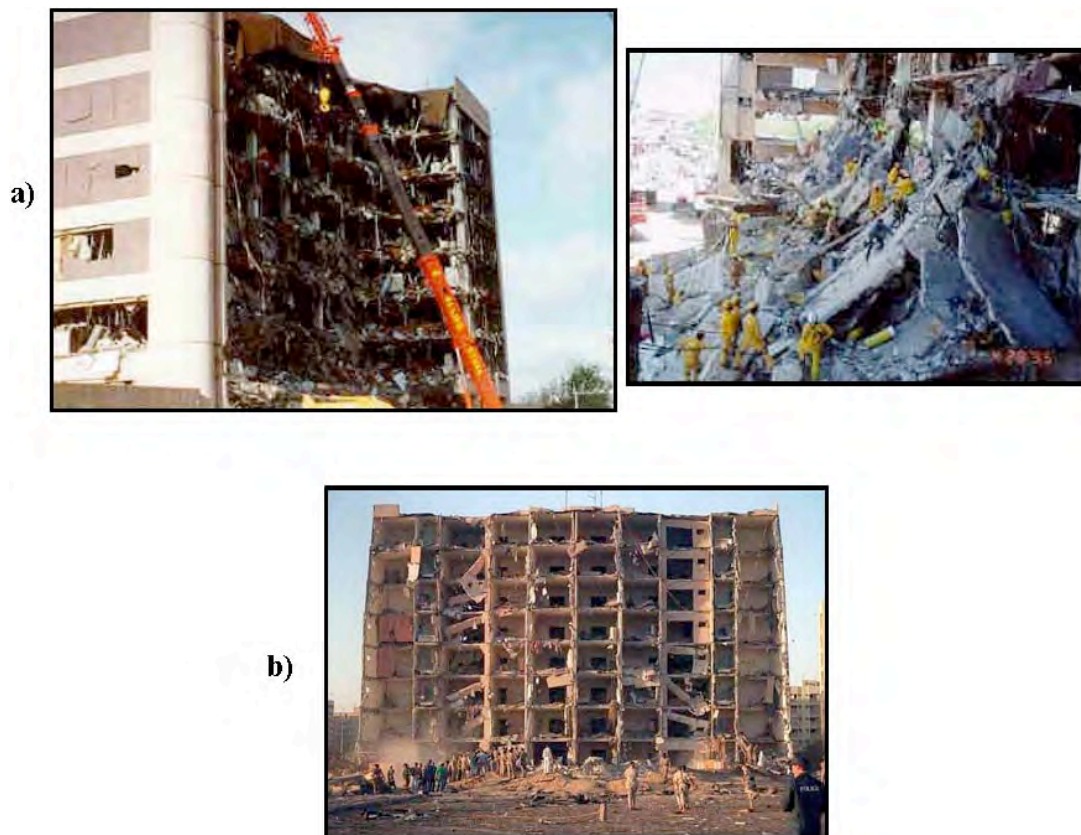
Terrorist attacks on U.S. infrastructure. a) Domestic terrorist attack on the Murrah Building, Oklahoma City resulting in progressive collapse; b) terrorist attack on the Khobar Tower Building, Saudi Arabia, resulting in extensive cladding destruction.
